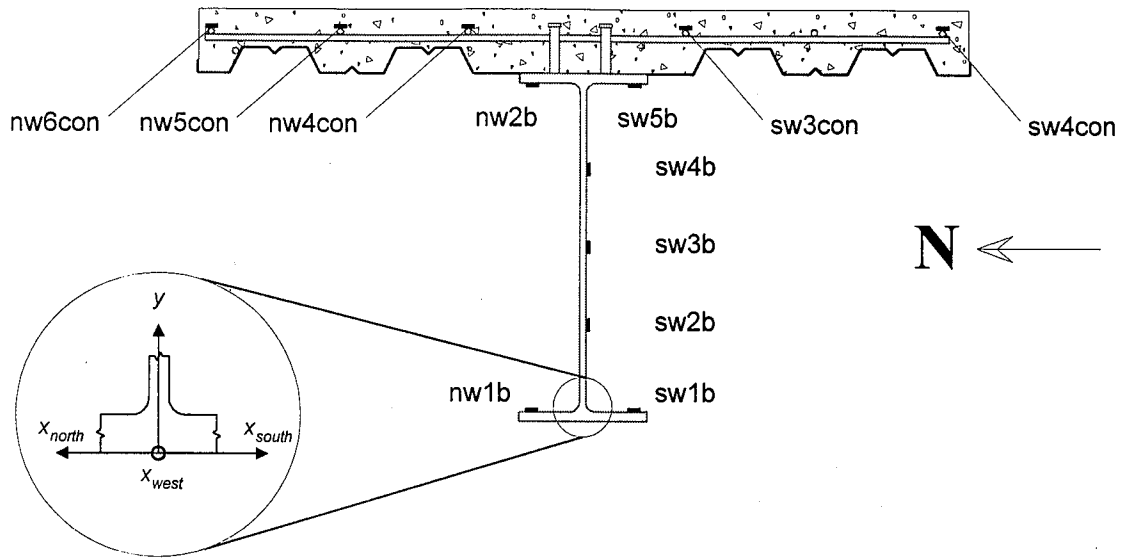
Section B-B: Strain Gages of West Girder Cross Section
